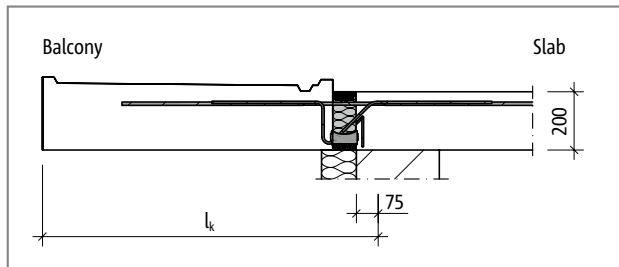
Schöck Isokorb® T type K-E, K-T: Static system, cross-section
